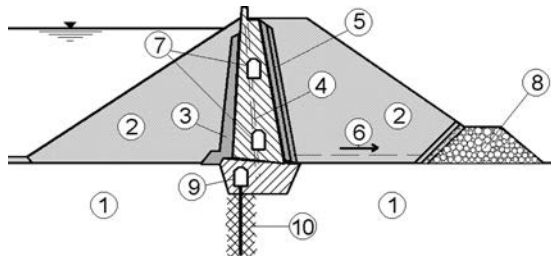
Dam with concrete diaphragm wall. (1) Bedrock; (2) earth material; (3) clay; (4) drainage pipes; (5) drainage layer; (6) water offtake; (7) drainage and inspection galleries; (8) downstream drainage; (9) grouting gallery; (10) grout curtain.
